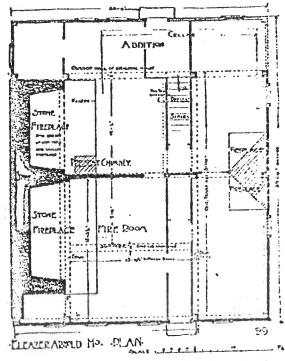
Eleazar Arnold House, Great Road, Lincoln, 1687. Ground storey plan. From Isham and Eronen, EARLY RHODE ISLAND HOUSES, 1895.
